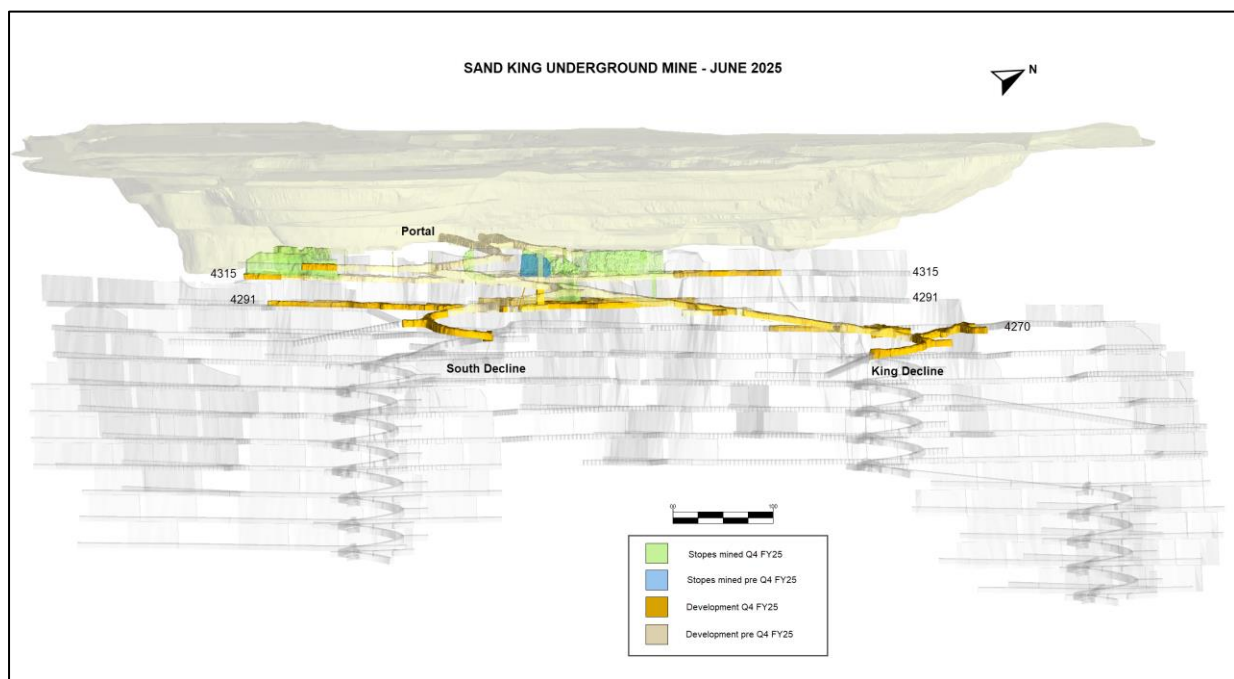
Sand King Underground long section showing actual development and underground mine design
